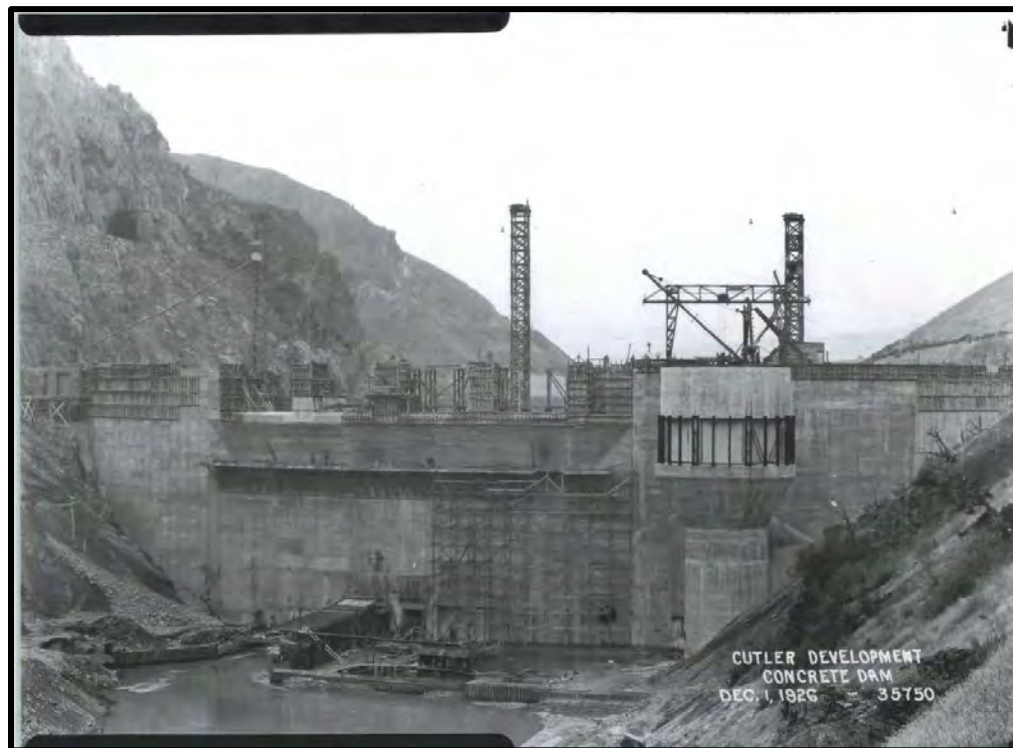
CUTLER DAM UNDER CONSTRUCTION DEC. 1, 1926
